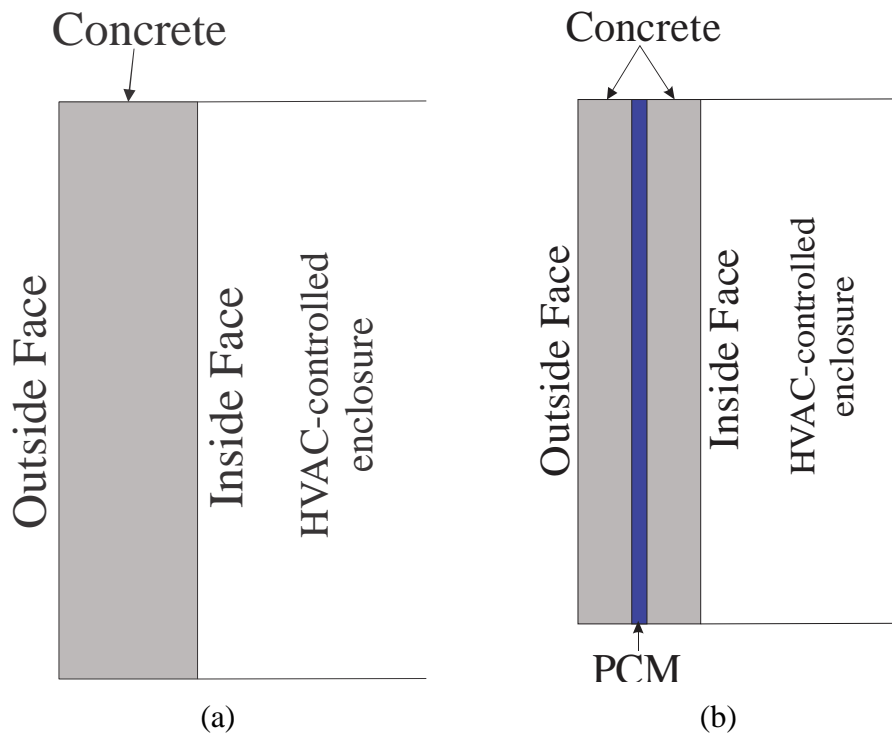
(a) Typical plain concrete wall, (b) Wall with a centrally placed 1cm PCM layer
